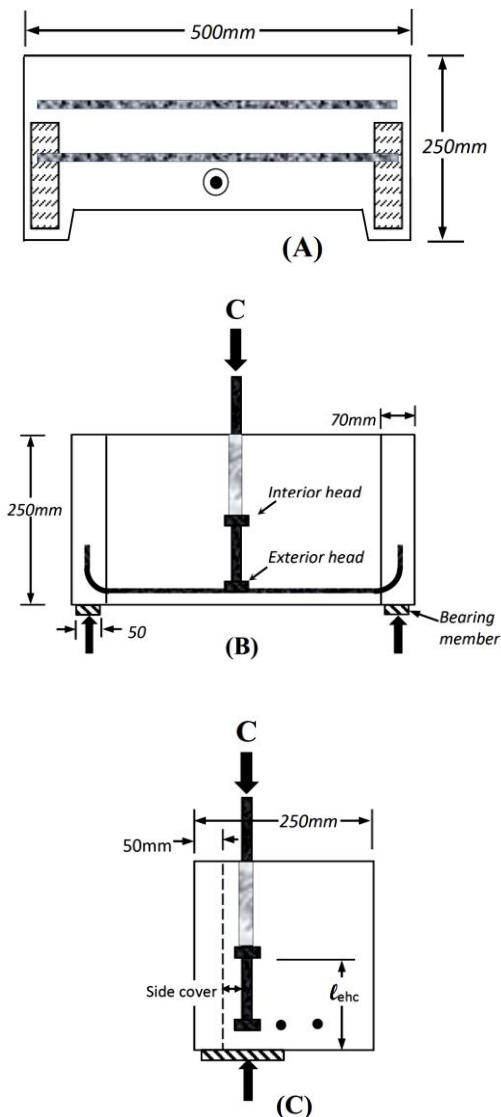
Test Specimen Definition in Compression Loading with Forces Acting on It (A) Top View (B) Front View (C) Side View
